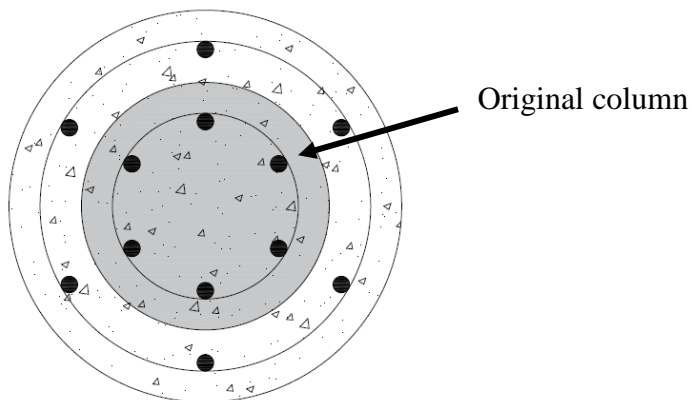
Reinforced concrete jacket retrofit of circular columns with circular jackets
